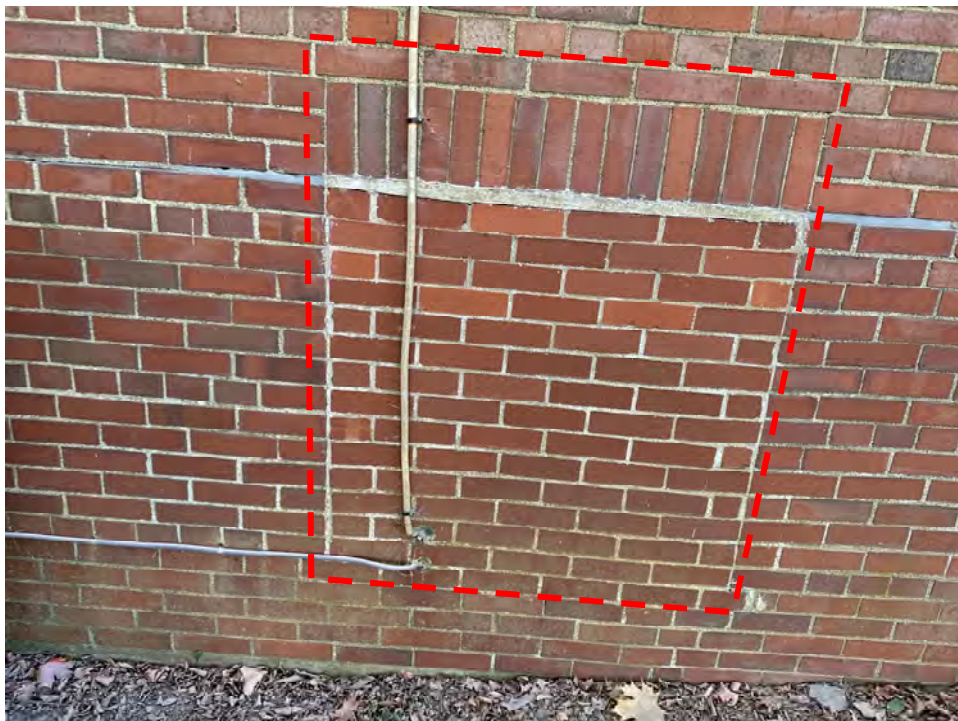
Brick infill at pre-existing window opening (typ. at two locations)
